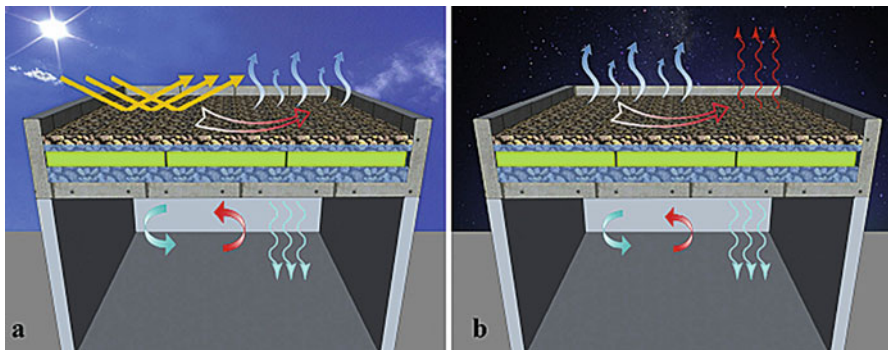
(a and b) Walkable roof pond with insulation embedded within the pond [27]
